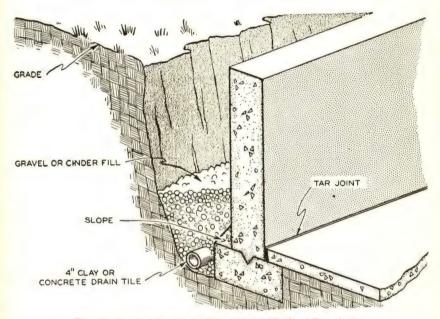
Footing Drains for Use with All Kinds of Foundations
